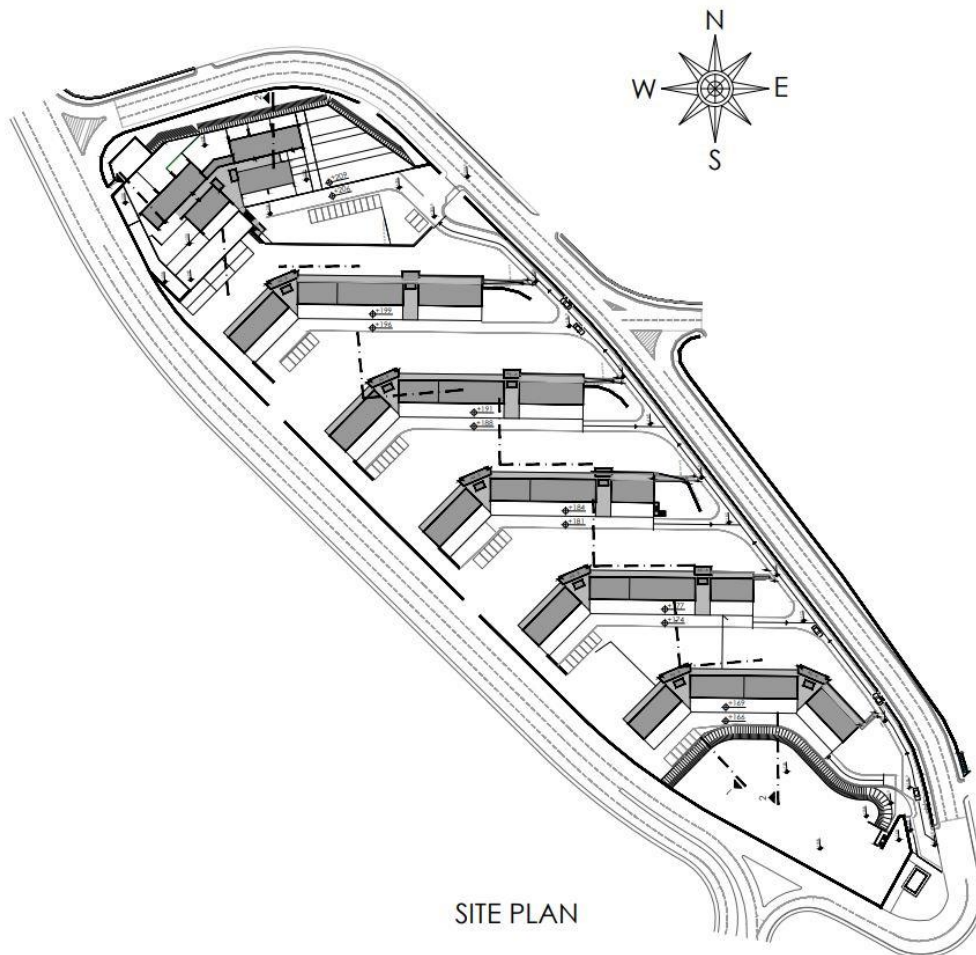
An example application site plan (Tepe İnşaat Sanayi AŞ., 2019).
